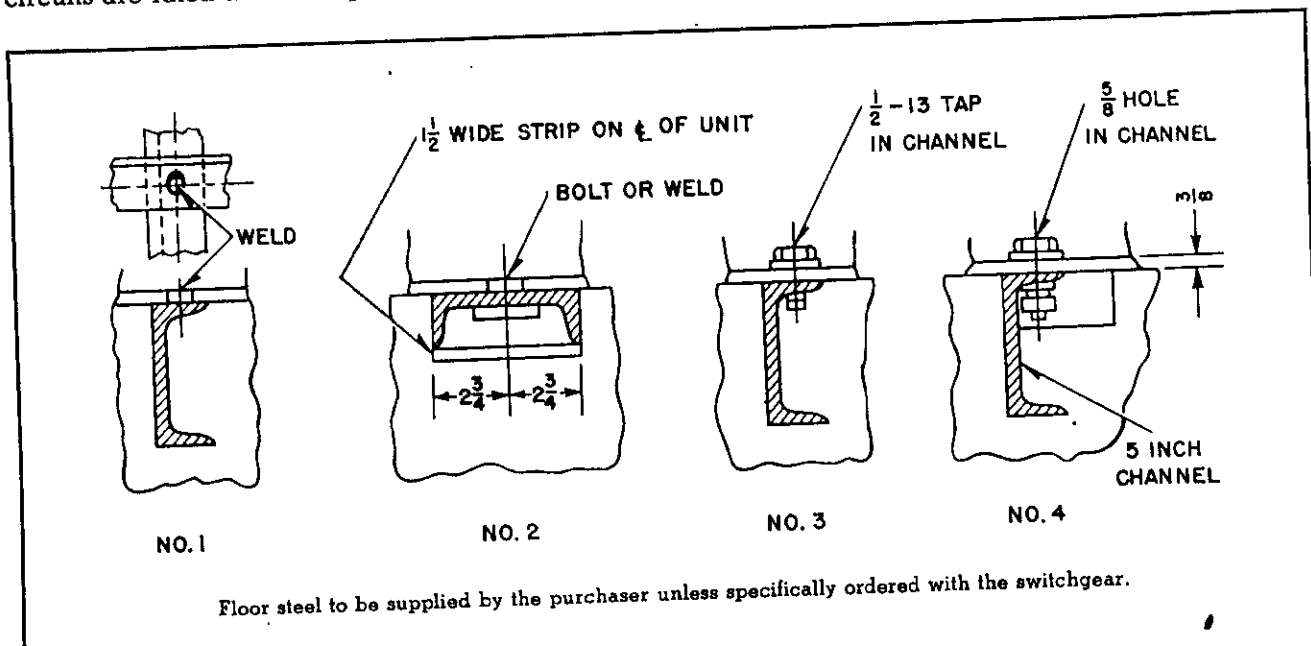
Suggested Methods of Installing Steel Channels in Floor
